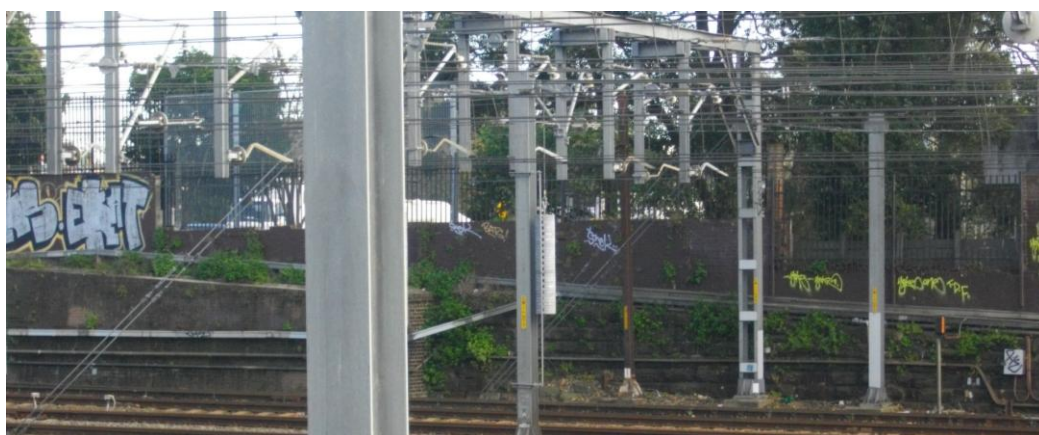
View west from Gibbons Street across the tracks showing the junction of the brick retaining wall and sandstone retaining wall to the north (at right) (Source: NBRSPARTNERS, July 2011)
